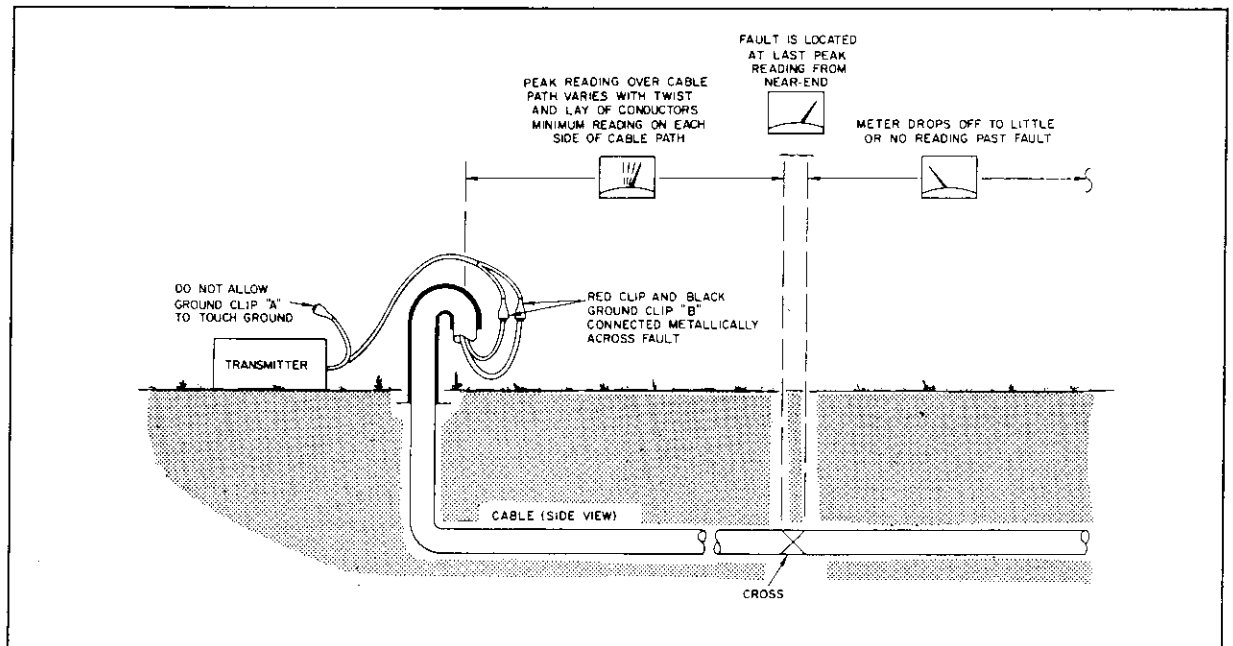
Locating a Cross in Buried and Underground Telephone Cable
